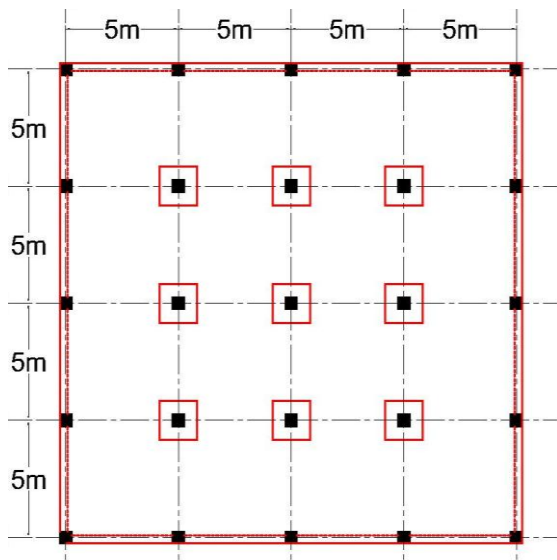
Floor plan of flat slab with drop panel (MRF)
